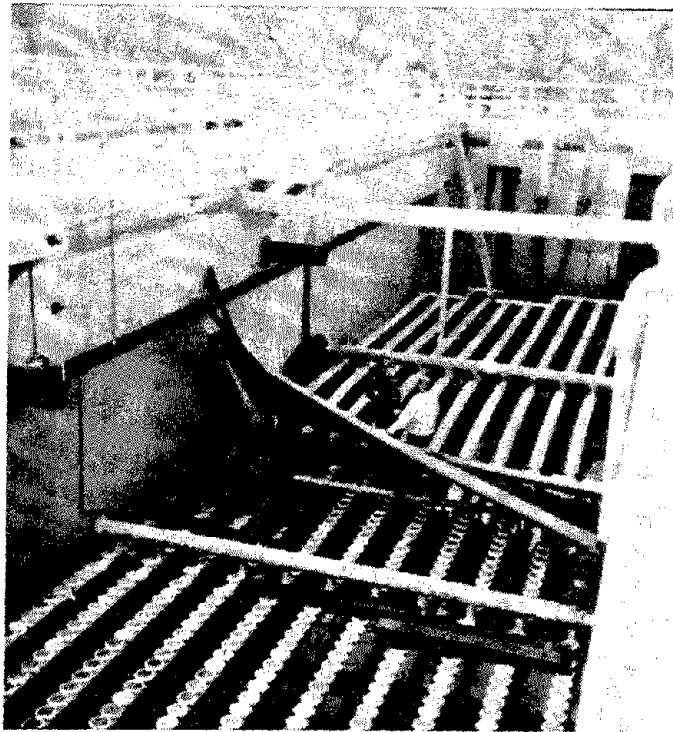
Valencia Plant aeration tank damaged PVC aeration header and grid piping due to failure of pipe support to concrete wall. Header support moved 8 feet is laying against wall at the top of photo. (LA Co. SAN)
